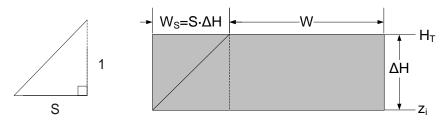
(Left) Side slope (Right)Rearranged cross section of road segment
